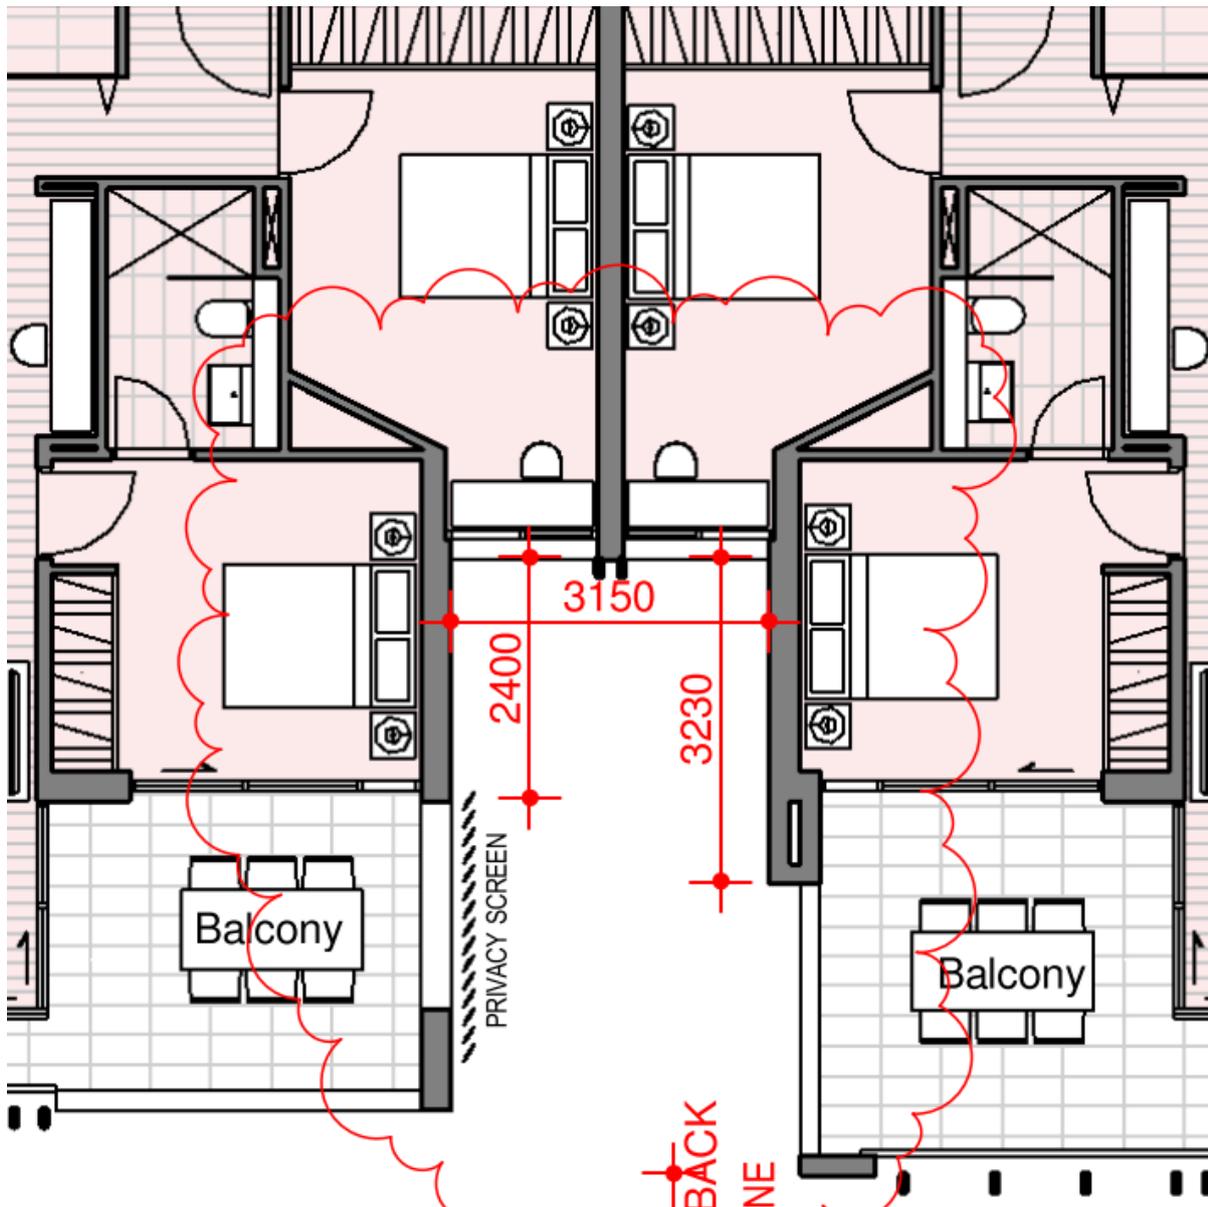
Plan drawing extract of typical setback bedroom arrangement.
